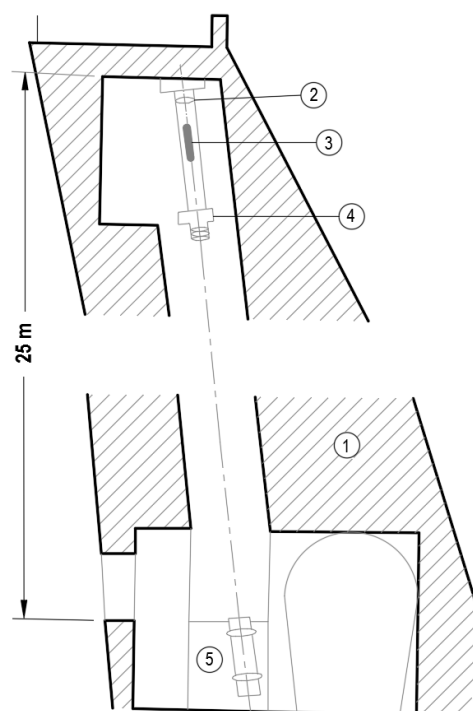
Schematic diagram of a laser plumbline installed in an arch dam: (1) Dam body (concrete); (2) mounting fixture; (3) laser tube; (4) modulating and focusing element; (5) receiver
